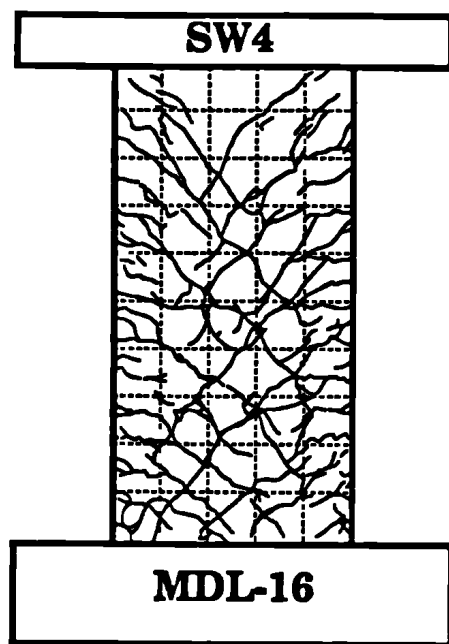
PilaSW4: DS2d - cracks at MDL-16 (larger shear crack widths)
